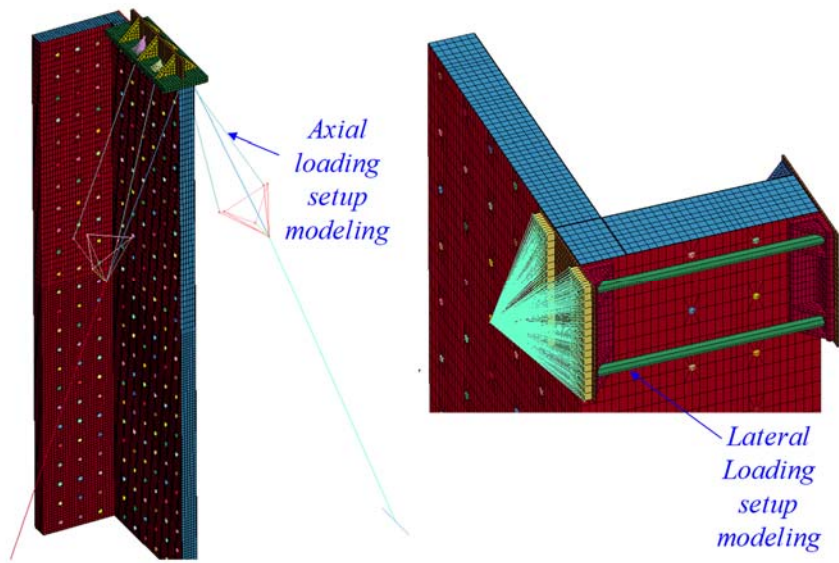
Details of the finite element model of the C-shape specimen's Axial Loading Setup (ALS) and Lateral Loading Setup (LLS)
